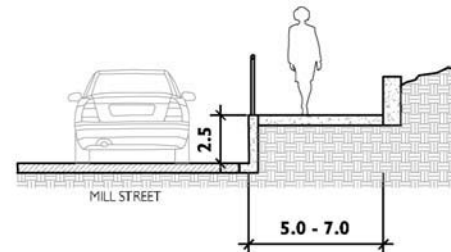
Mill Street Sidewalk Improvement: Alternative A
